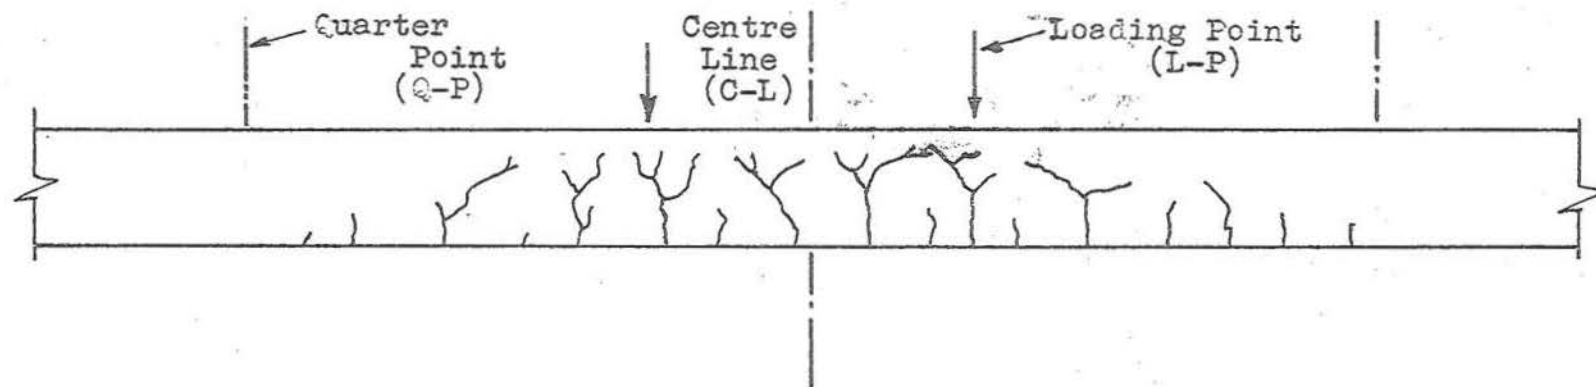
CRACKING PATTERN FOR BEAM 1 (Static test)
